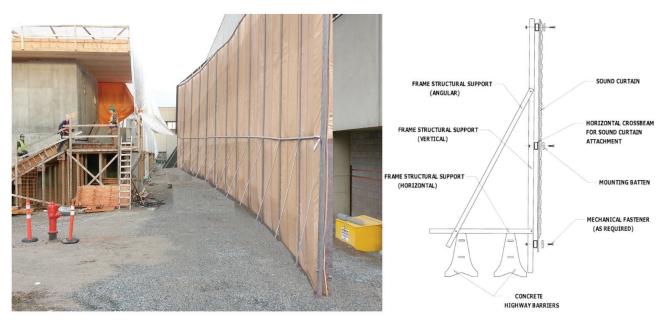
Left: rendering of a noise barrier setup for the CEME classroom. Right: section of the noise barrier. Source: All Noise Control, n.d.
